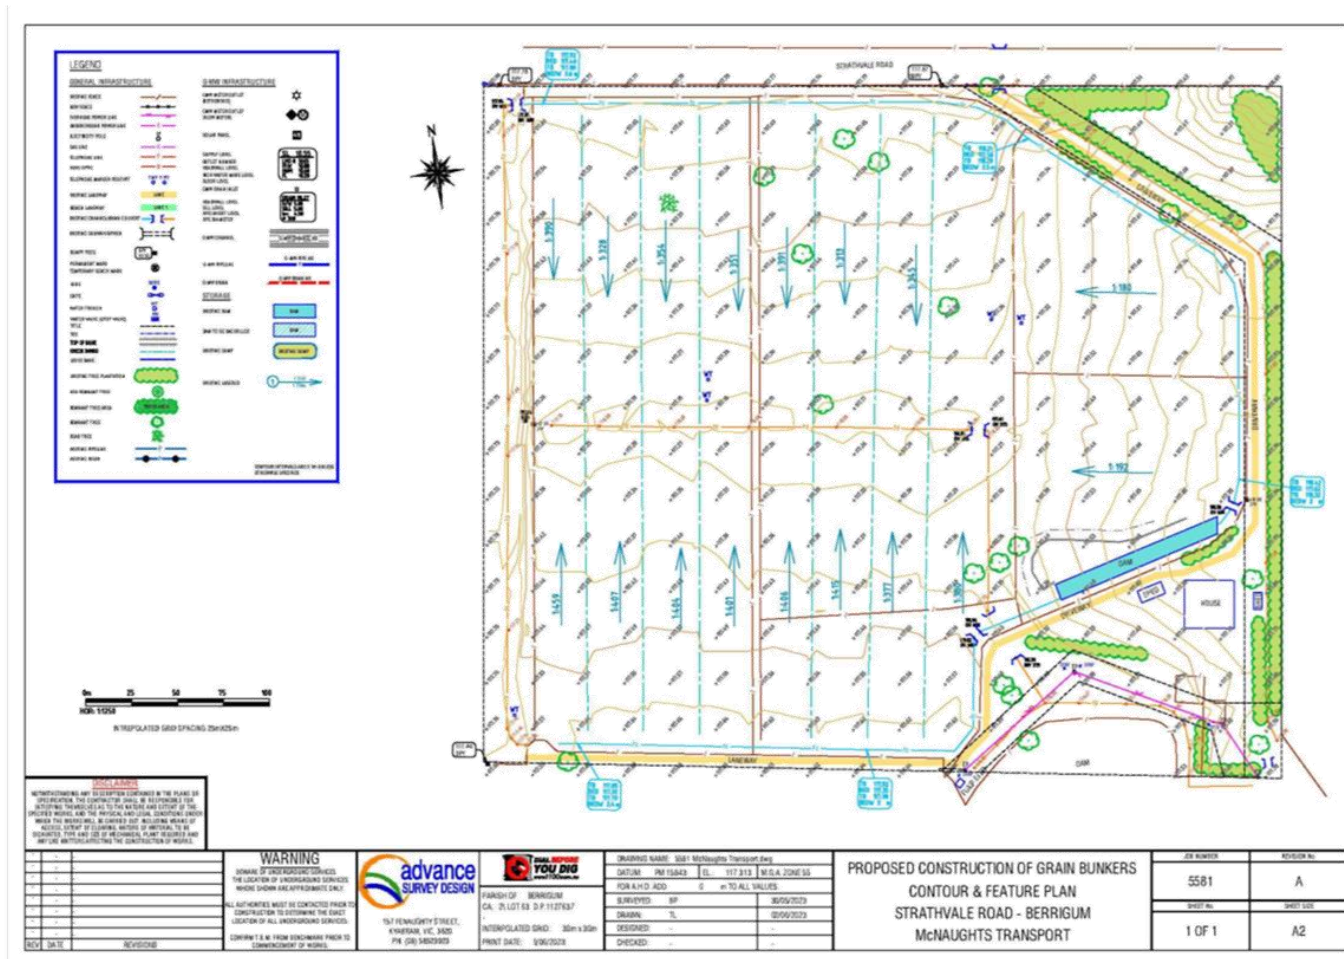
Construction Plan for grain bunkers, 92 Strathvale Road Berrigan (Advance Survey Design, dated 5/6/23).
